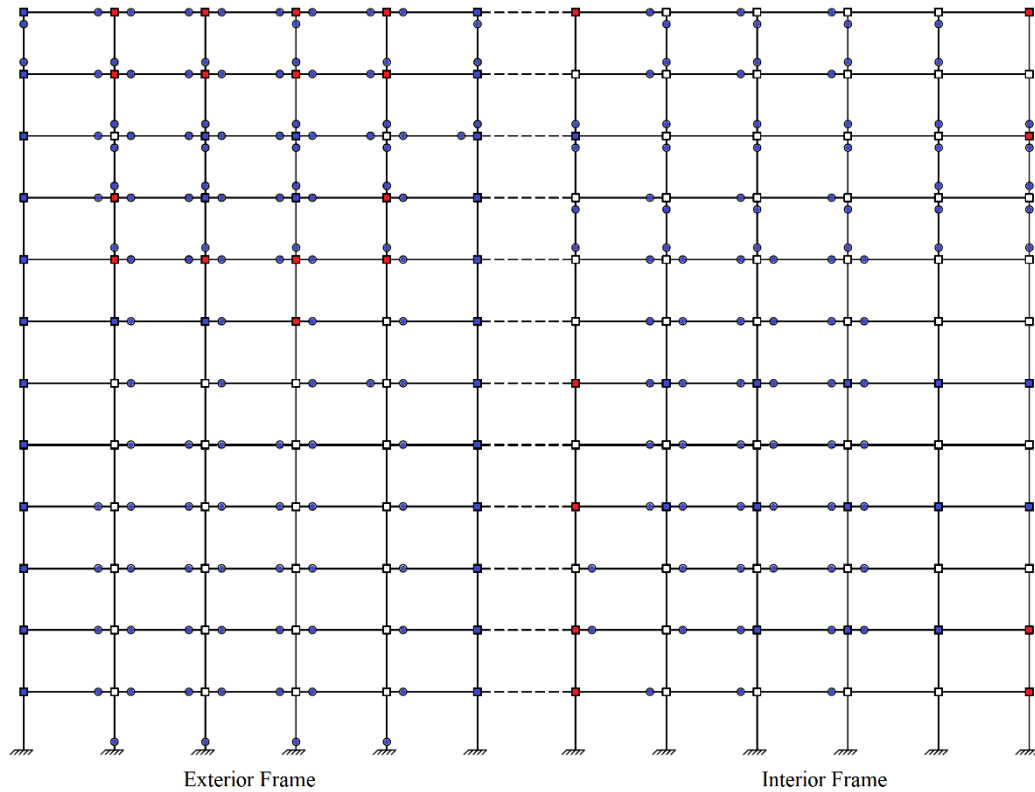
Damage patterns in the 12-story building at collapse – Yield (Blue) & Ultimate (Red)
